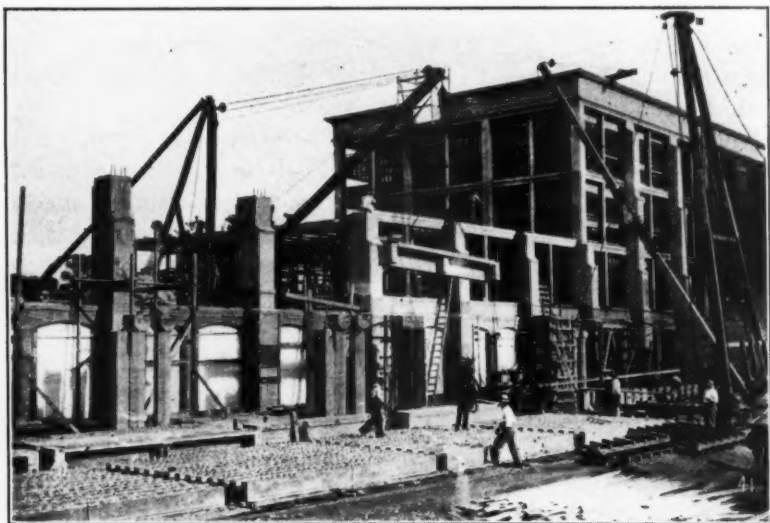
UNITED SHOE MACHINERY COMPANY CONCRETE BUILDING IN PROCESS OF CONSTRUCTION
